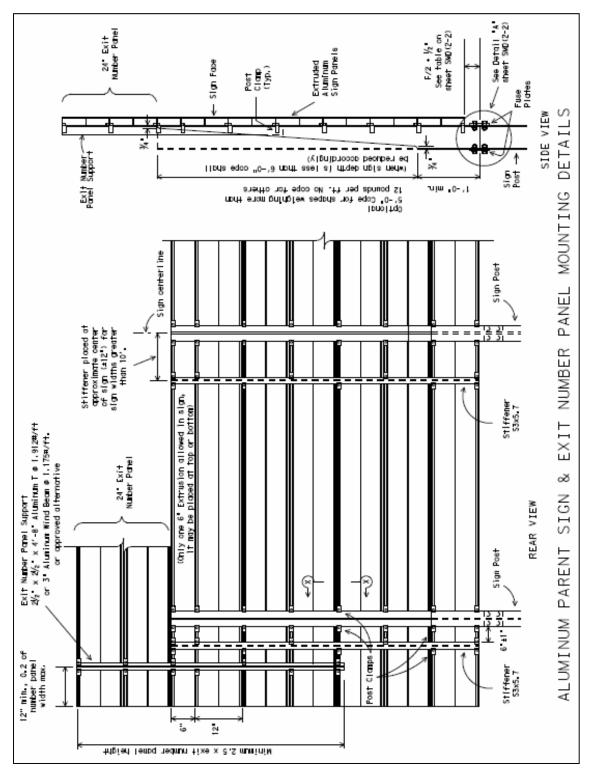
Current TxDOT Vertical Stiffener Detail Sheet.
